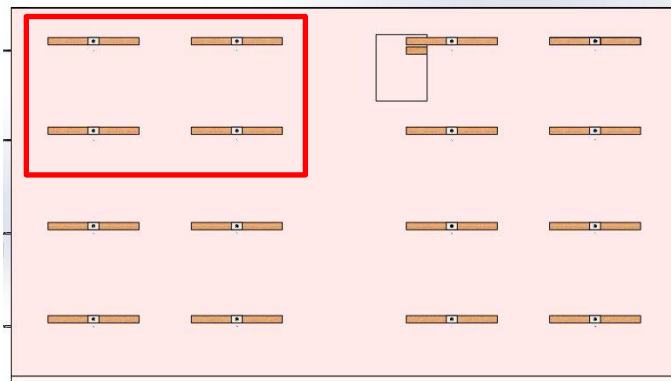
Elevation view of the East (J1-J10) wall with load pads installed. The red box indicates the load pads acting on one whiffle tree.
